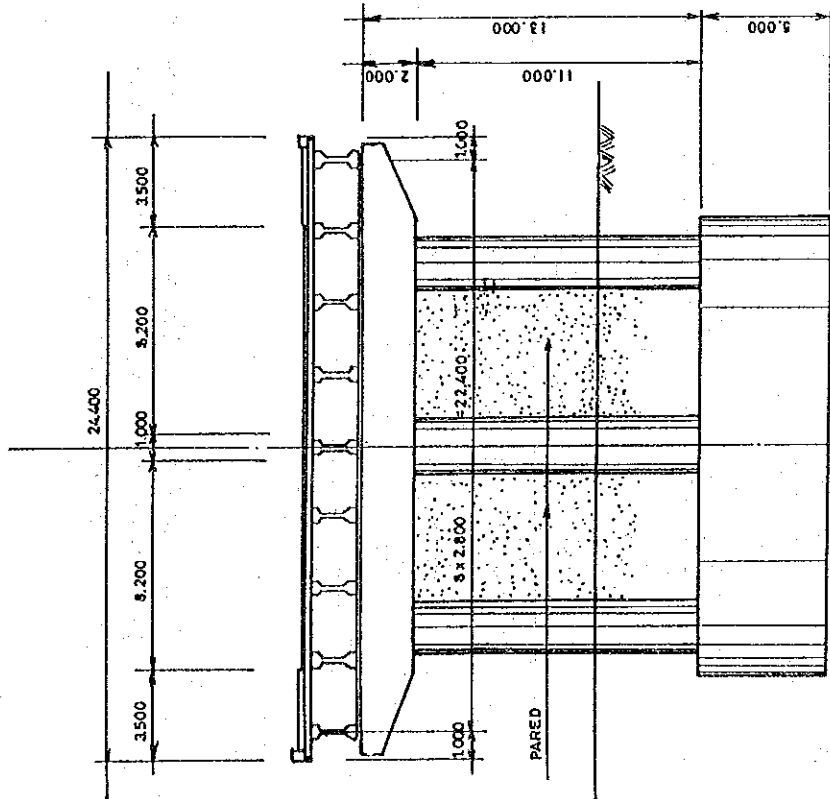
Simple Post-tensioned Concrete I-Girder with Dumbell Pier on Caisson Foundation
